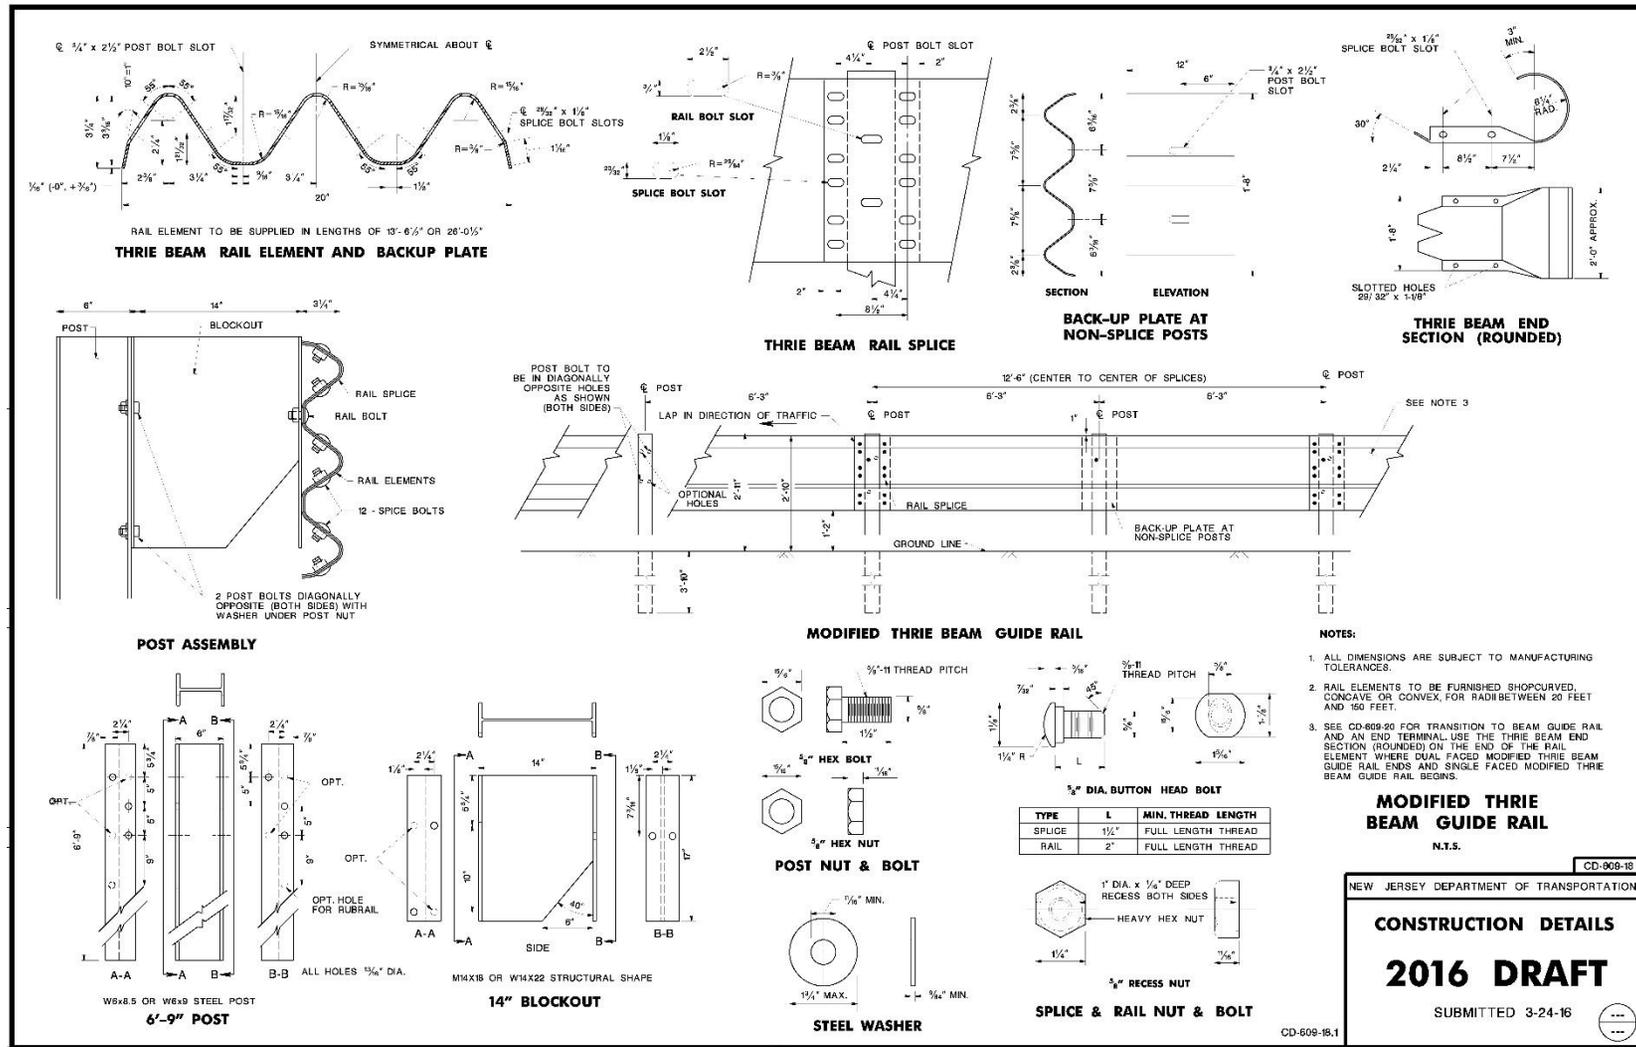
NJDOT Modified Thrie Beam Details, Test No. MTB-1
